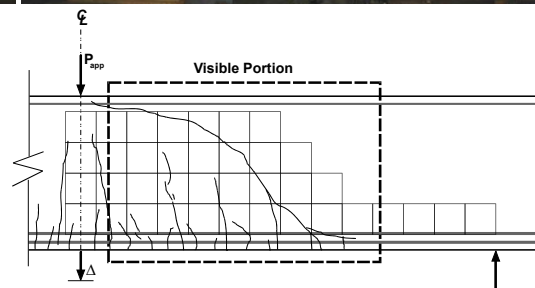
Progression of Failure Crack in Specimen SB-40-N-1
